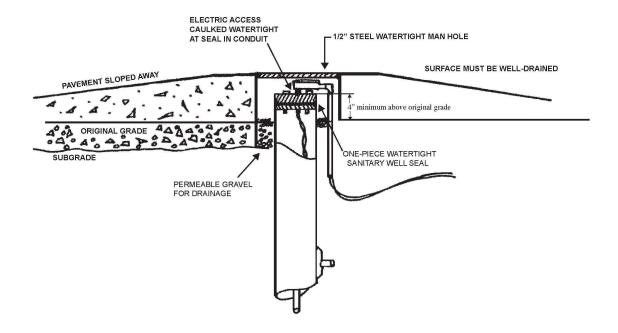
Well pits - Minimum requirements for pits installed on or before April 10, 1953.
